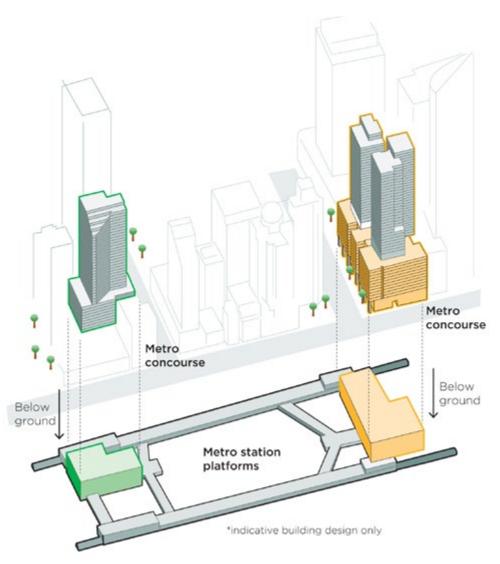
Proposed Pitt Street North OSD (subject of this application) and its relationship to the proposed Pitt Street South OSD (subject of a separate application) and the underground metro station.
